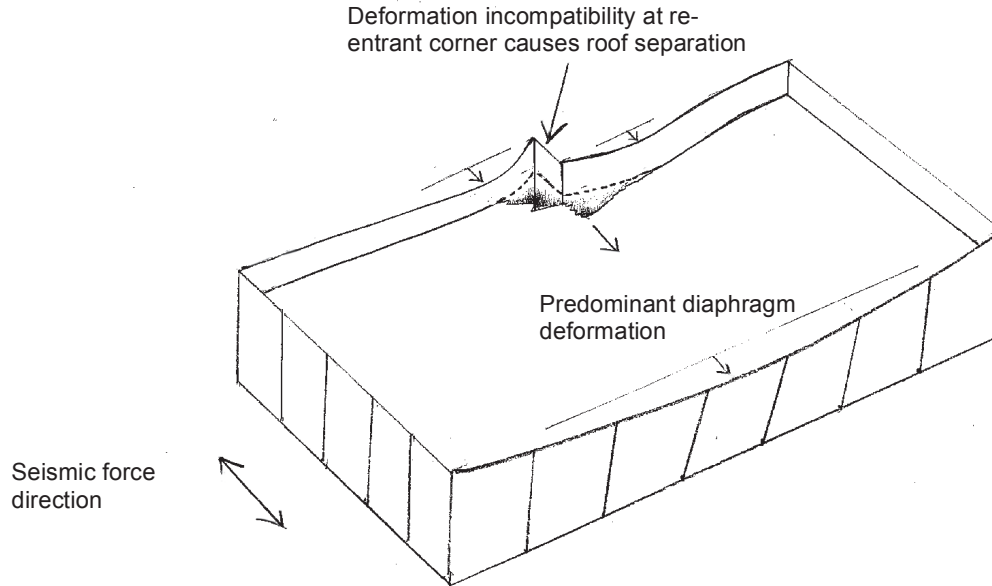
Effect of Shear Wall at Re-entrant Corner on Diaphragm Deformation
